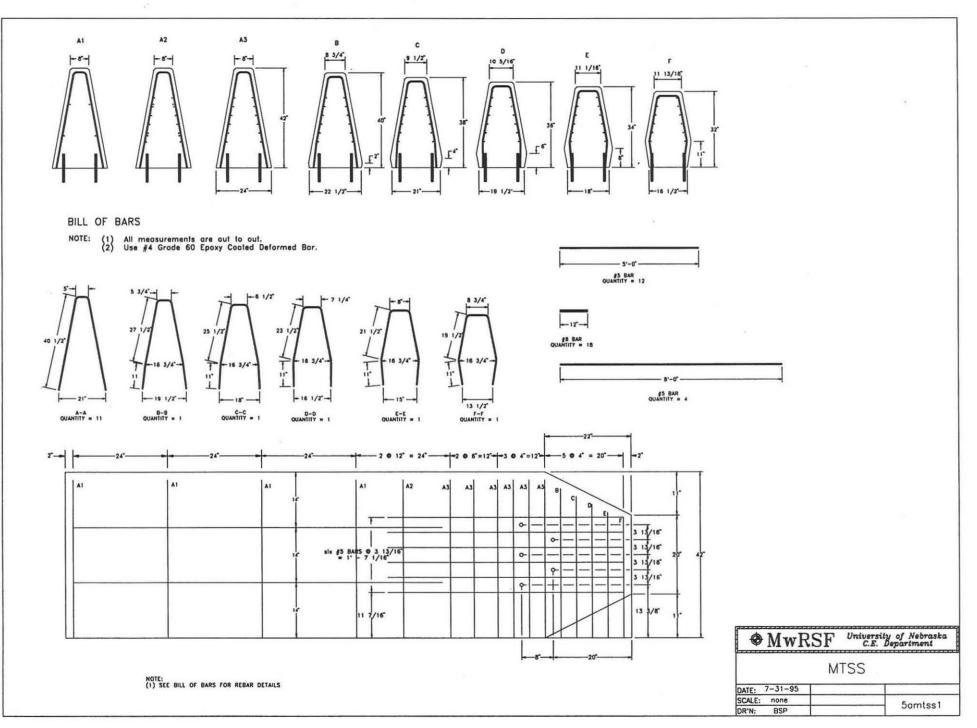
Reinforcement Scheme for the Single Slope CMB and Rebar Details.
